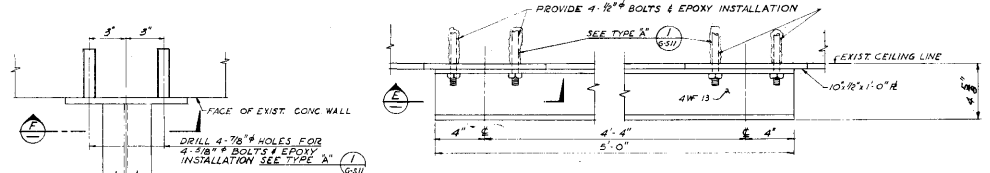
(INTERIOR CONDUIT SUPPORT AT EXIST. INSERTS)
